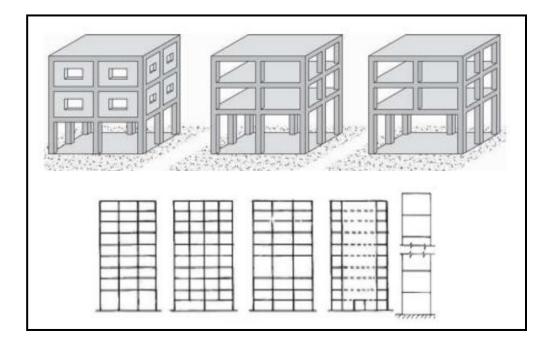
Examples of Soft Storey and Weak Storey Configurations: a) Stiff Upper Floor due to Infill Walls, b) Different Storey Height, c) Discontinuous Column
